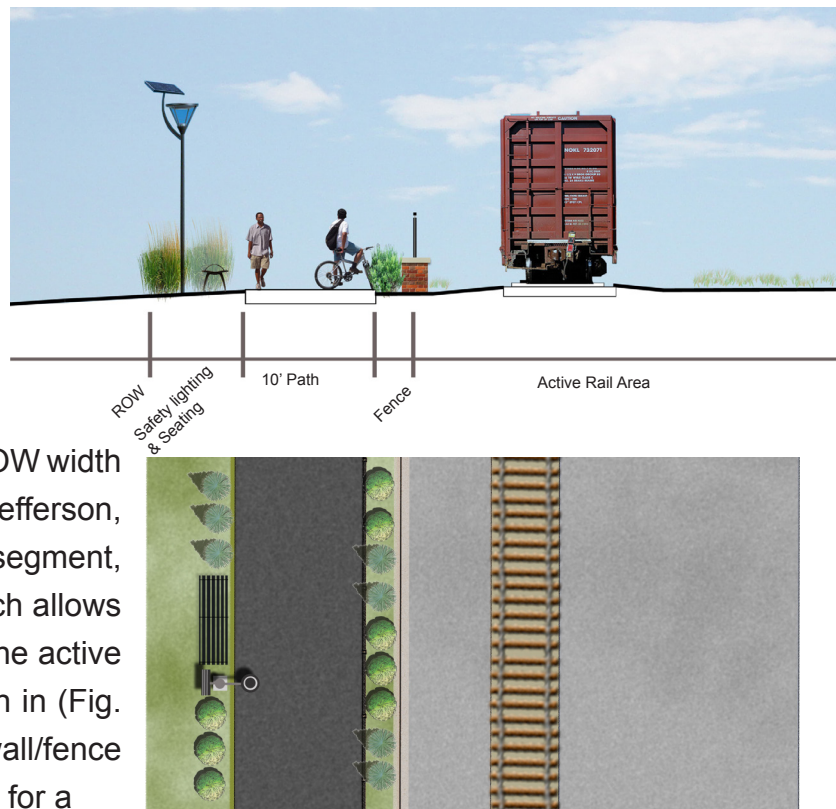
Section of a typical trail layout in the Stadium segment. Total ROW width 55'
